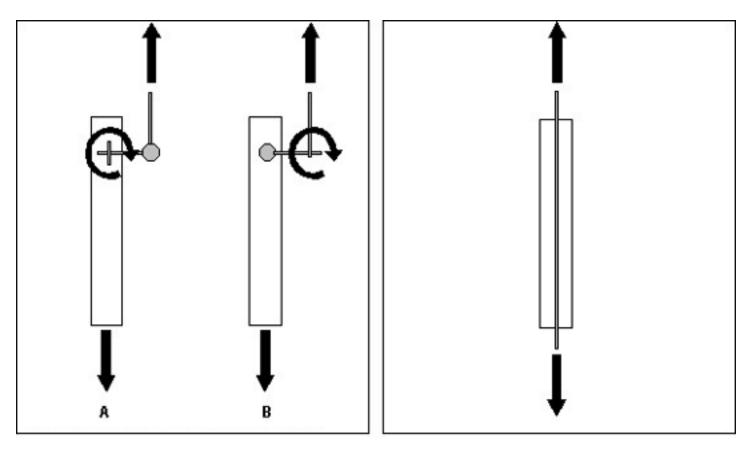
Suspended glazing systems A: stud system, bending in the glass B: articulated bolt system: bending in the support
